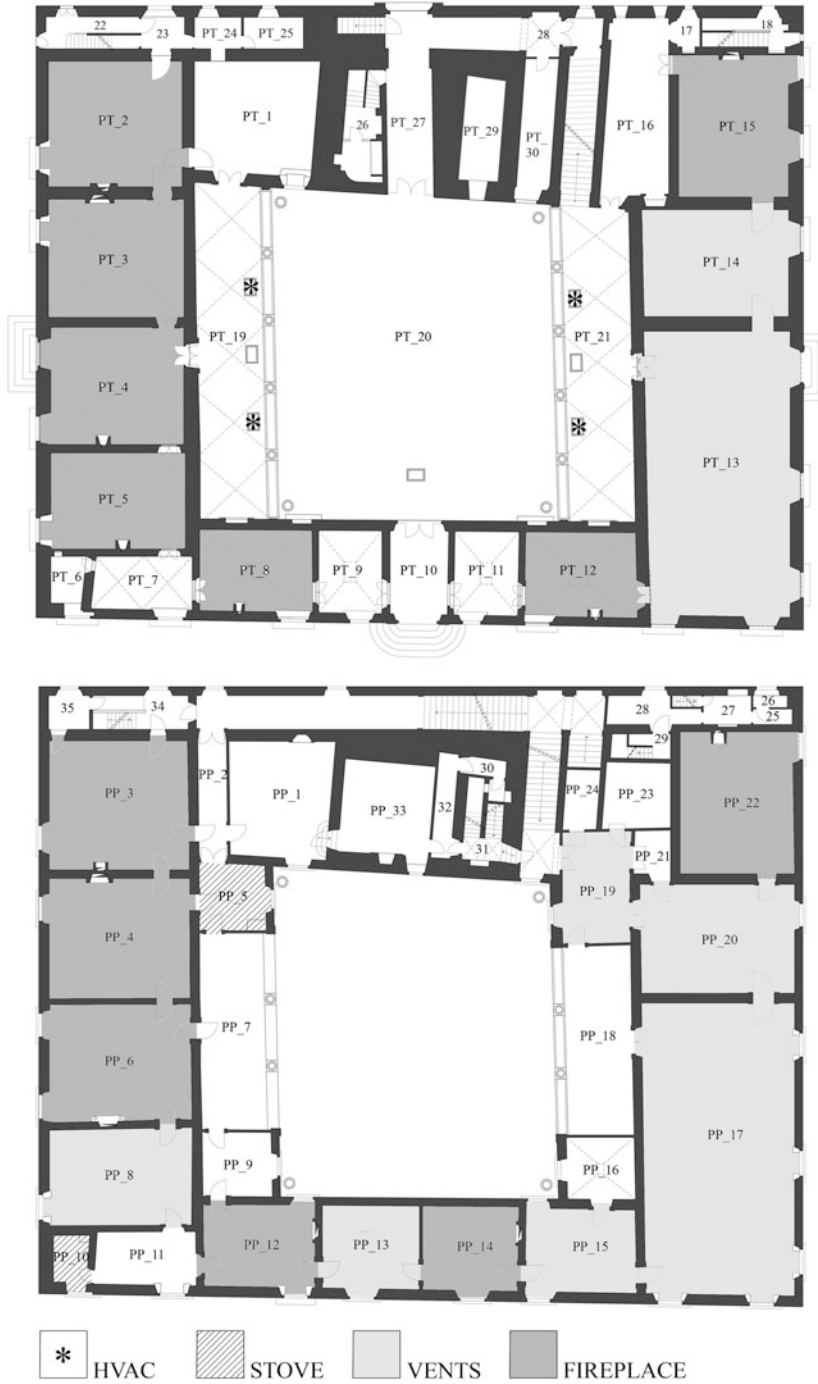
Maps of the ground and first floor highlighting the type of technical system (fireplace, vents, stoves, and HVAC system)
